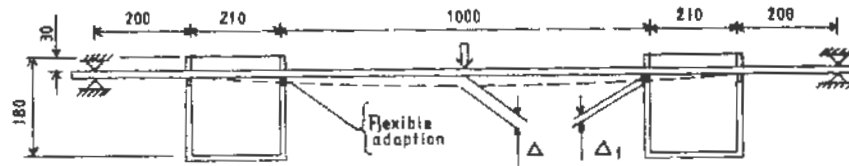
Test arrangement for movements of bars at casting of the concrete.
